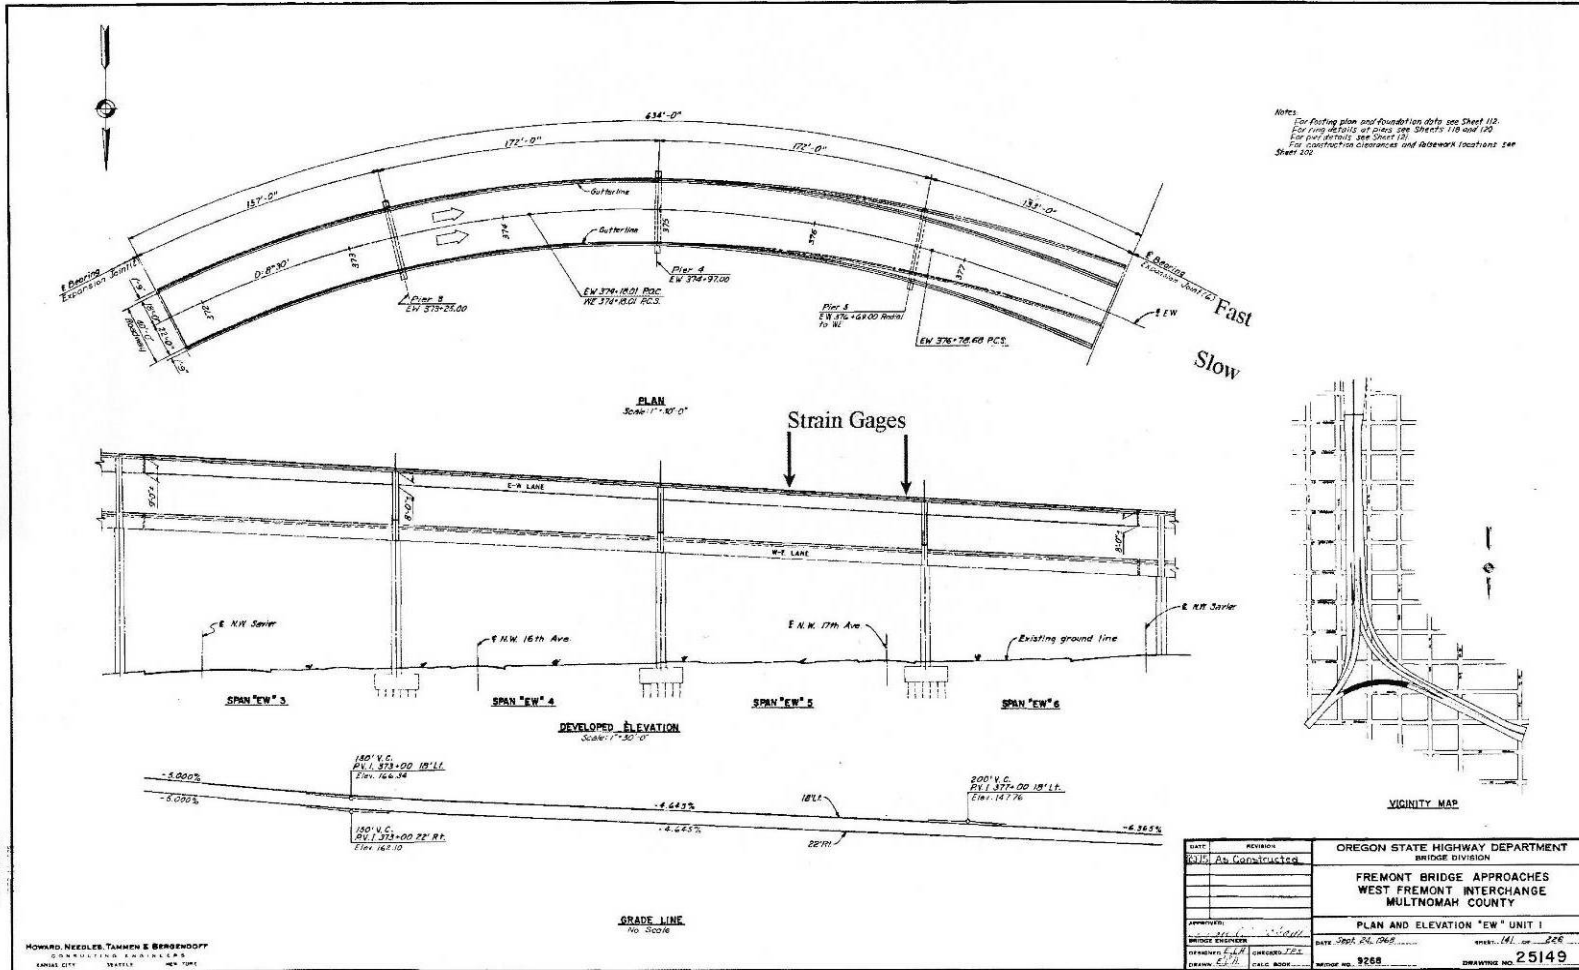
Instrumented sections for Bridge superstructure 09268W (EW line).
